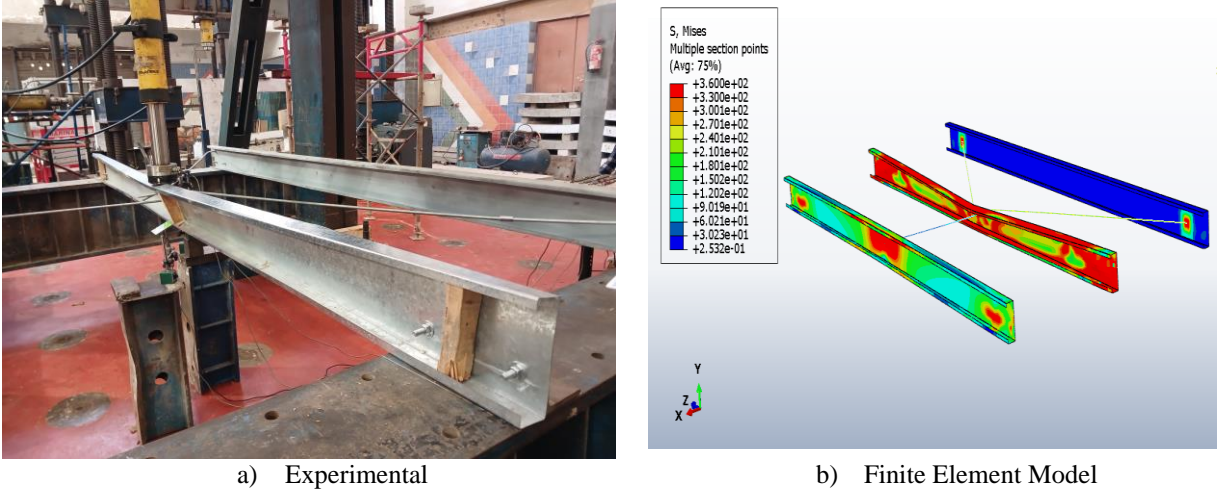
Failure modes of purlins with tie rods, specimen PT-1, C-section, $t=1\text{mm}$.
